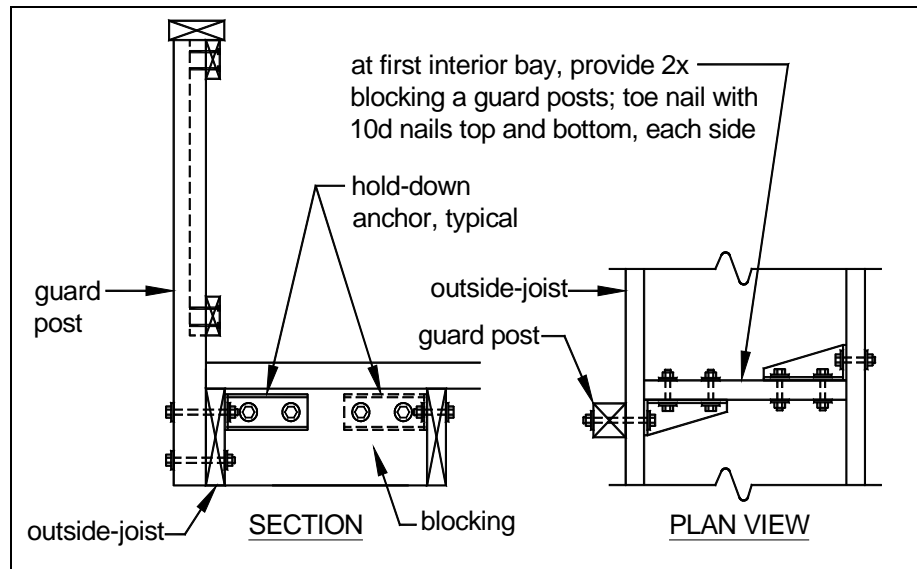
GUARD POST TO OUTSIDE JOIST DETAIL
